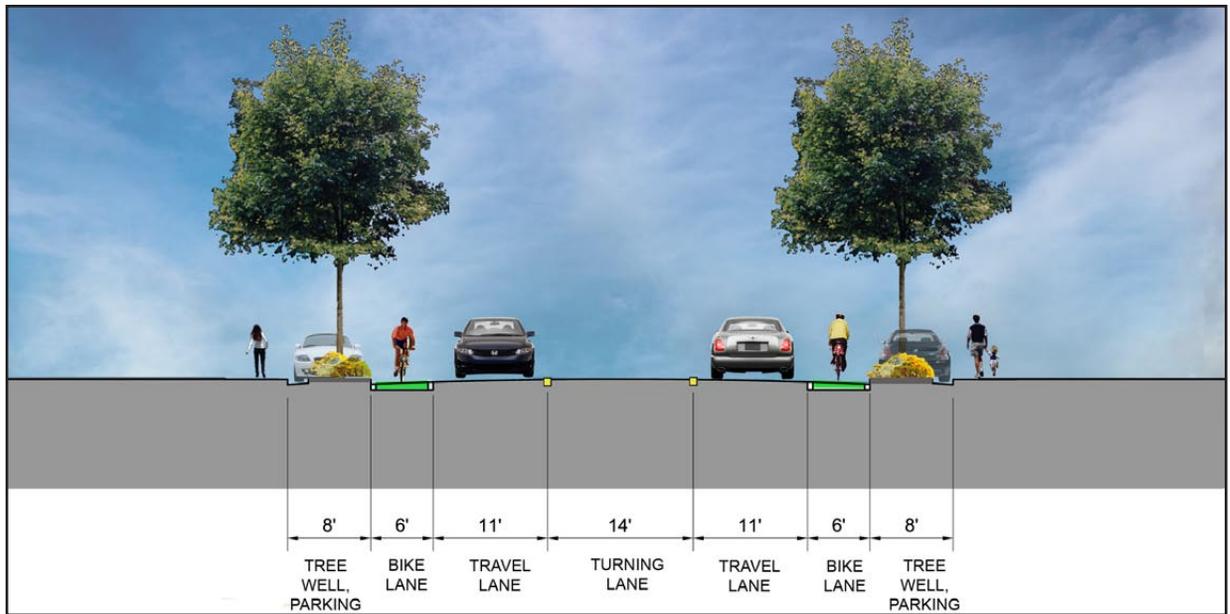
Durfee Avenue west of South El Monte High School, towards Santa Anita Avenue — Proposed.
